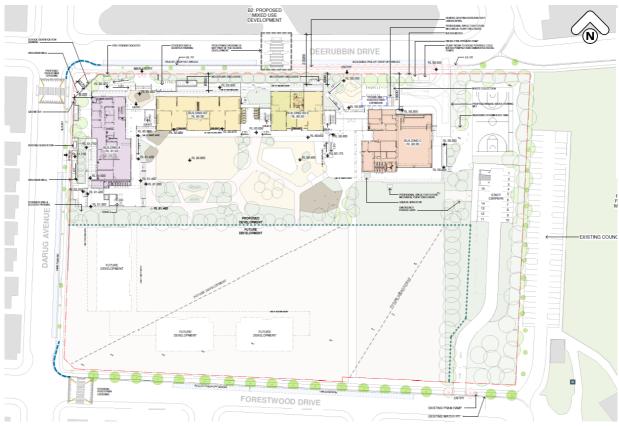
Development Proposal Site Plan (Source: NBRS)
